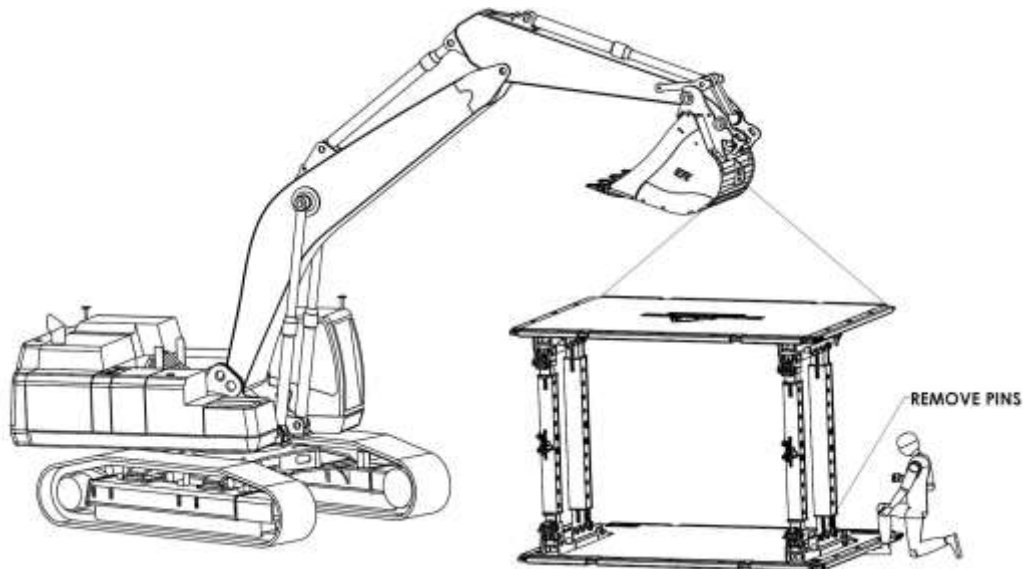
Disassembly Step Three – Remove Bottom Coupler Pins
